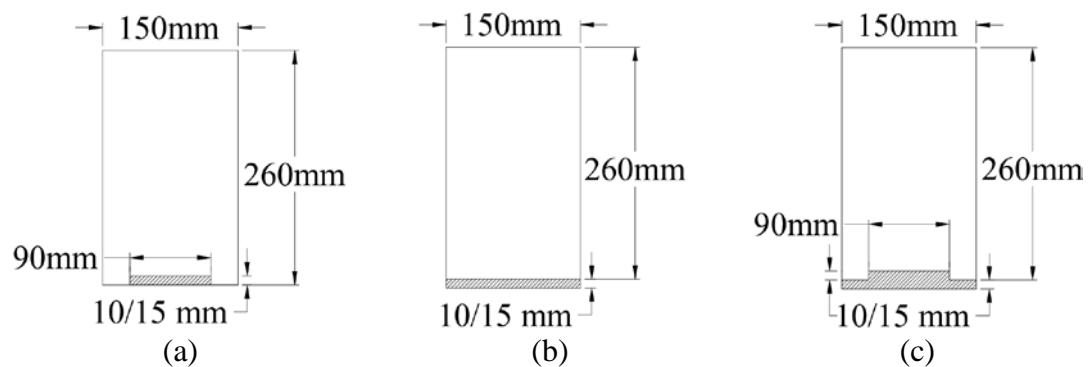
Strengthening details: a) Section of a NSE strengthened beam, b) Section of an EB strengthened beam, and c) A section of a NSE/EB strengthened beam
